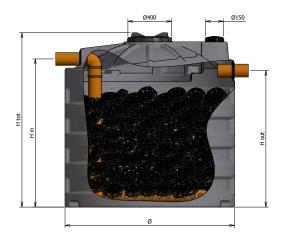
Installation of IMHOFF model for domestic use, drainage into public sewers
